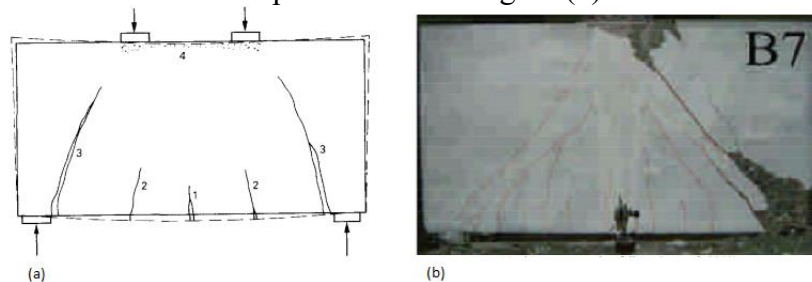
Flexure shear failure, (a) failure of deep beams [Subedi et al 1986] , (b) [lu et al. 2013]
